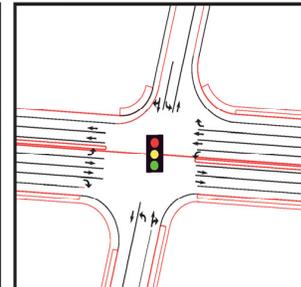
ALTERNATIVE A AND ALTERNATIVE C BETWEEN MIDWAY AVENUE TO DOWELL ROAD
